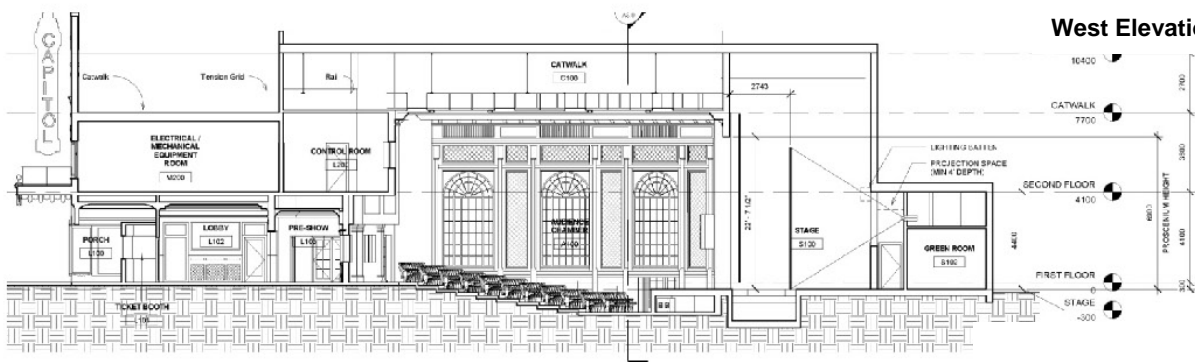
Proposed Theatre – Second Floor, Elevation & Section (HIP Architects 2010)
